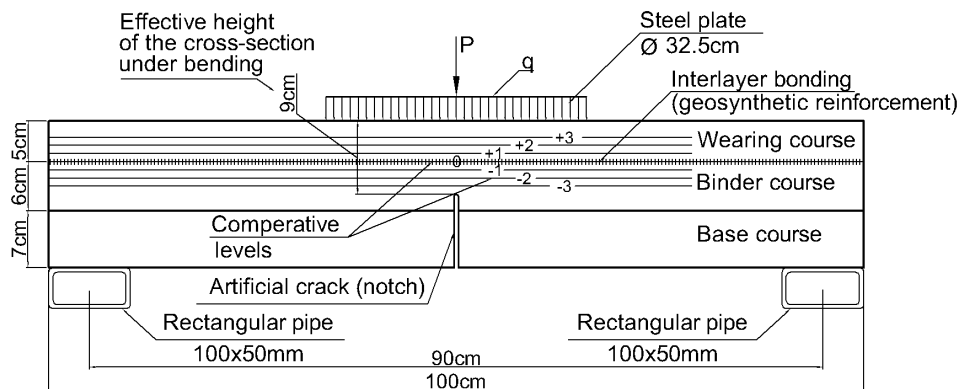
Testing arrangement for fatigue crack propagation on large dimension asphalt pavement sample
